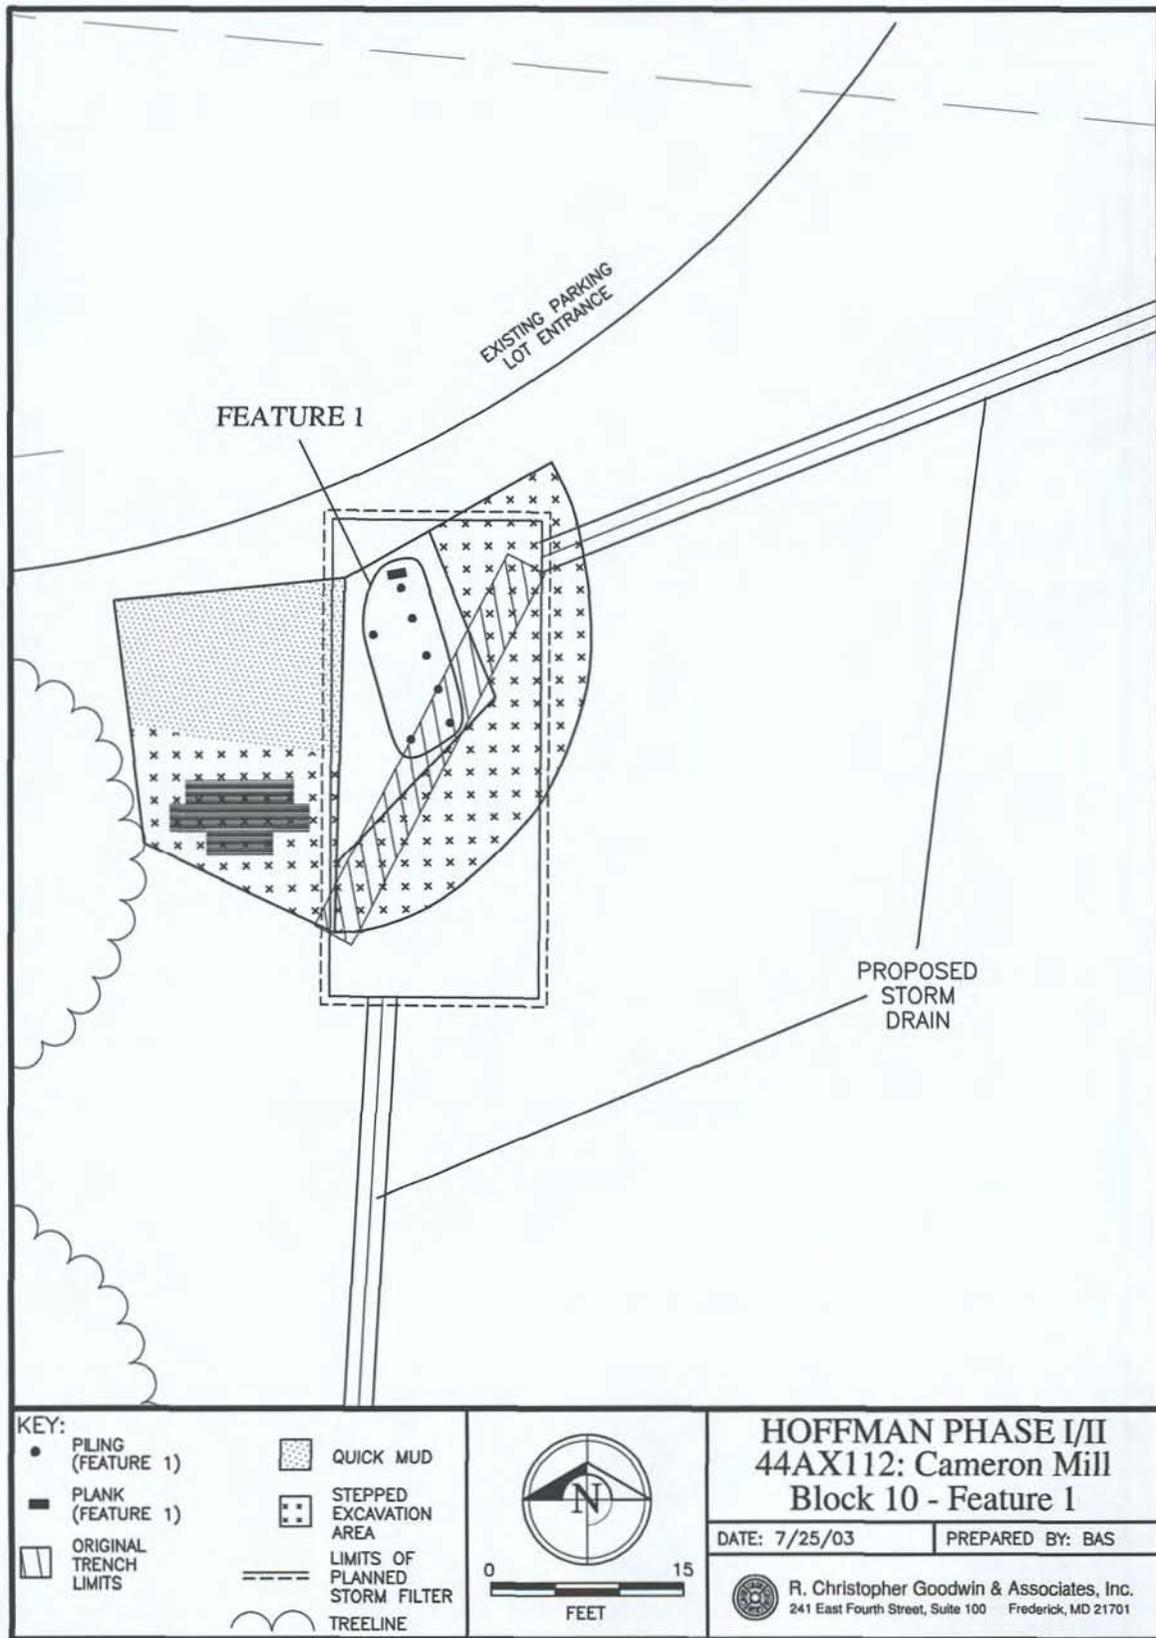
Hoffman property, Block 10: Plan view of proposed and actual excavation areas
